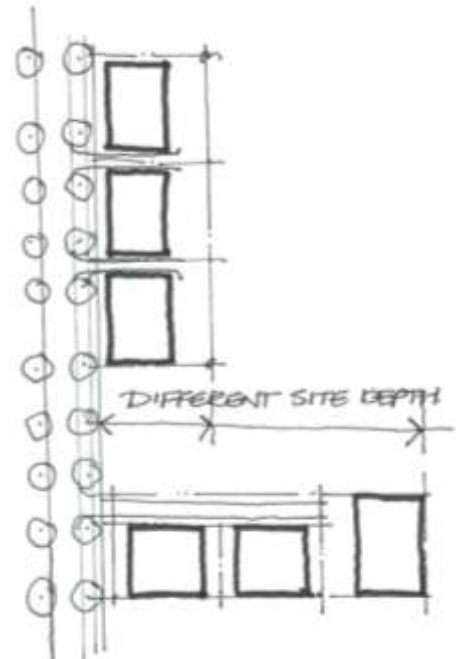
Narrow front and long depth site (bottom) with rear buildings accessed off right of way compared to single building depth sites (top) all facing the street.
